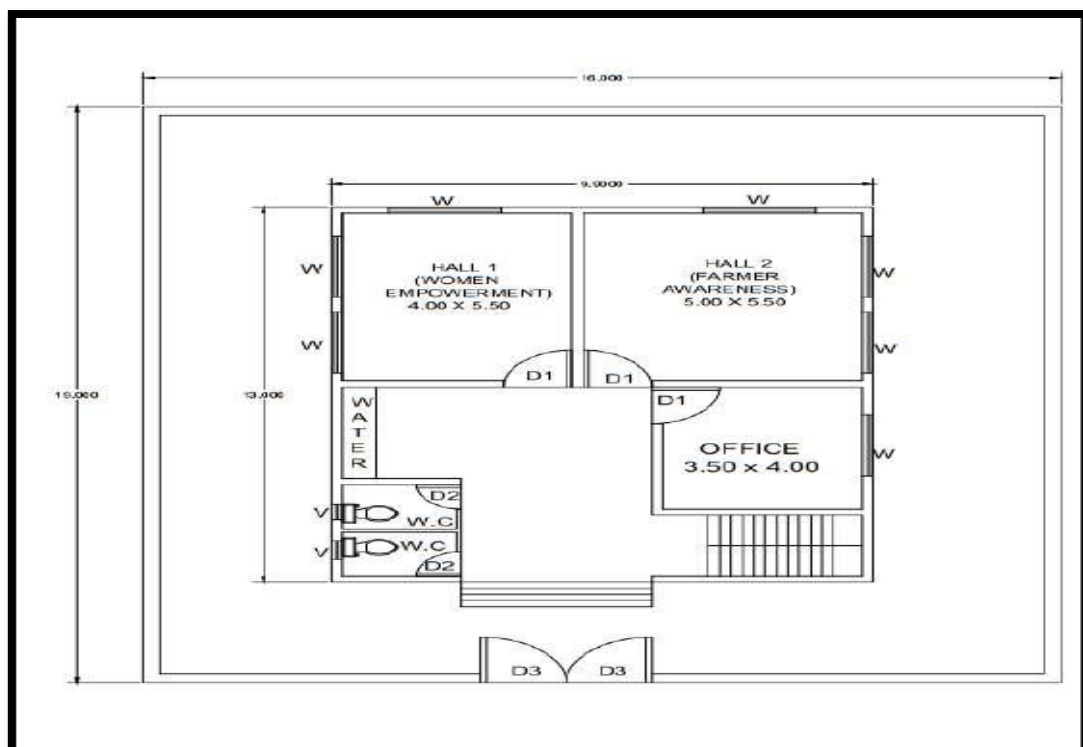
(a) Plan of the Ground floor of Skill Development Centre
